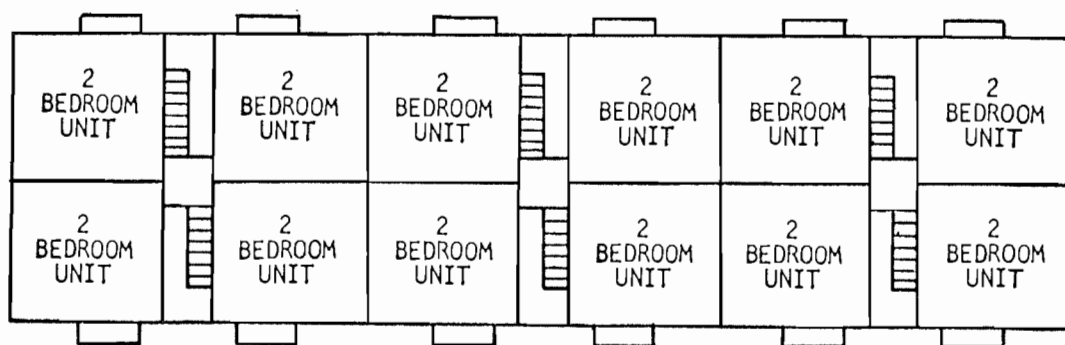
Floor Plan for Characteristic Low-Rise Structure
